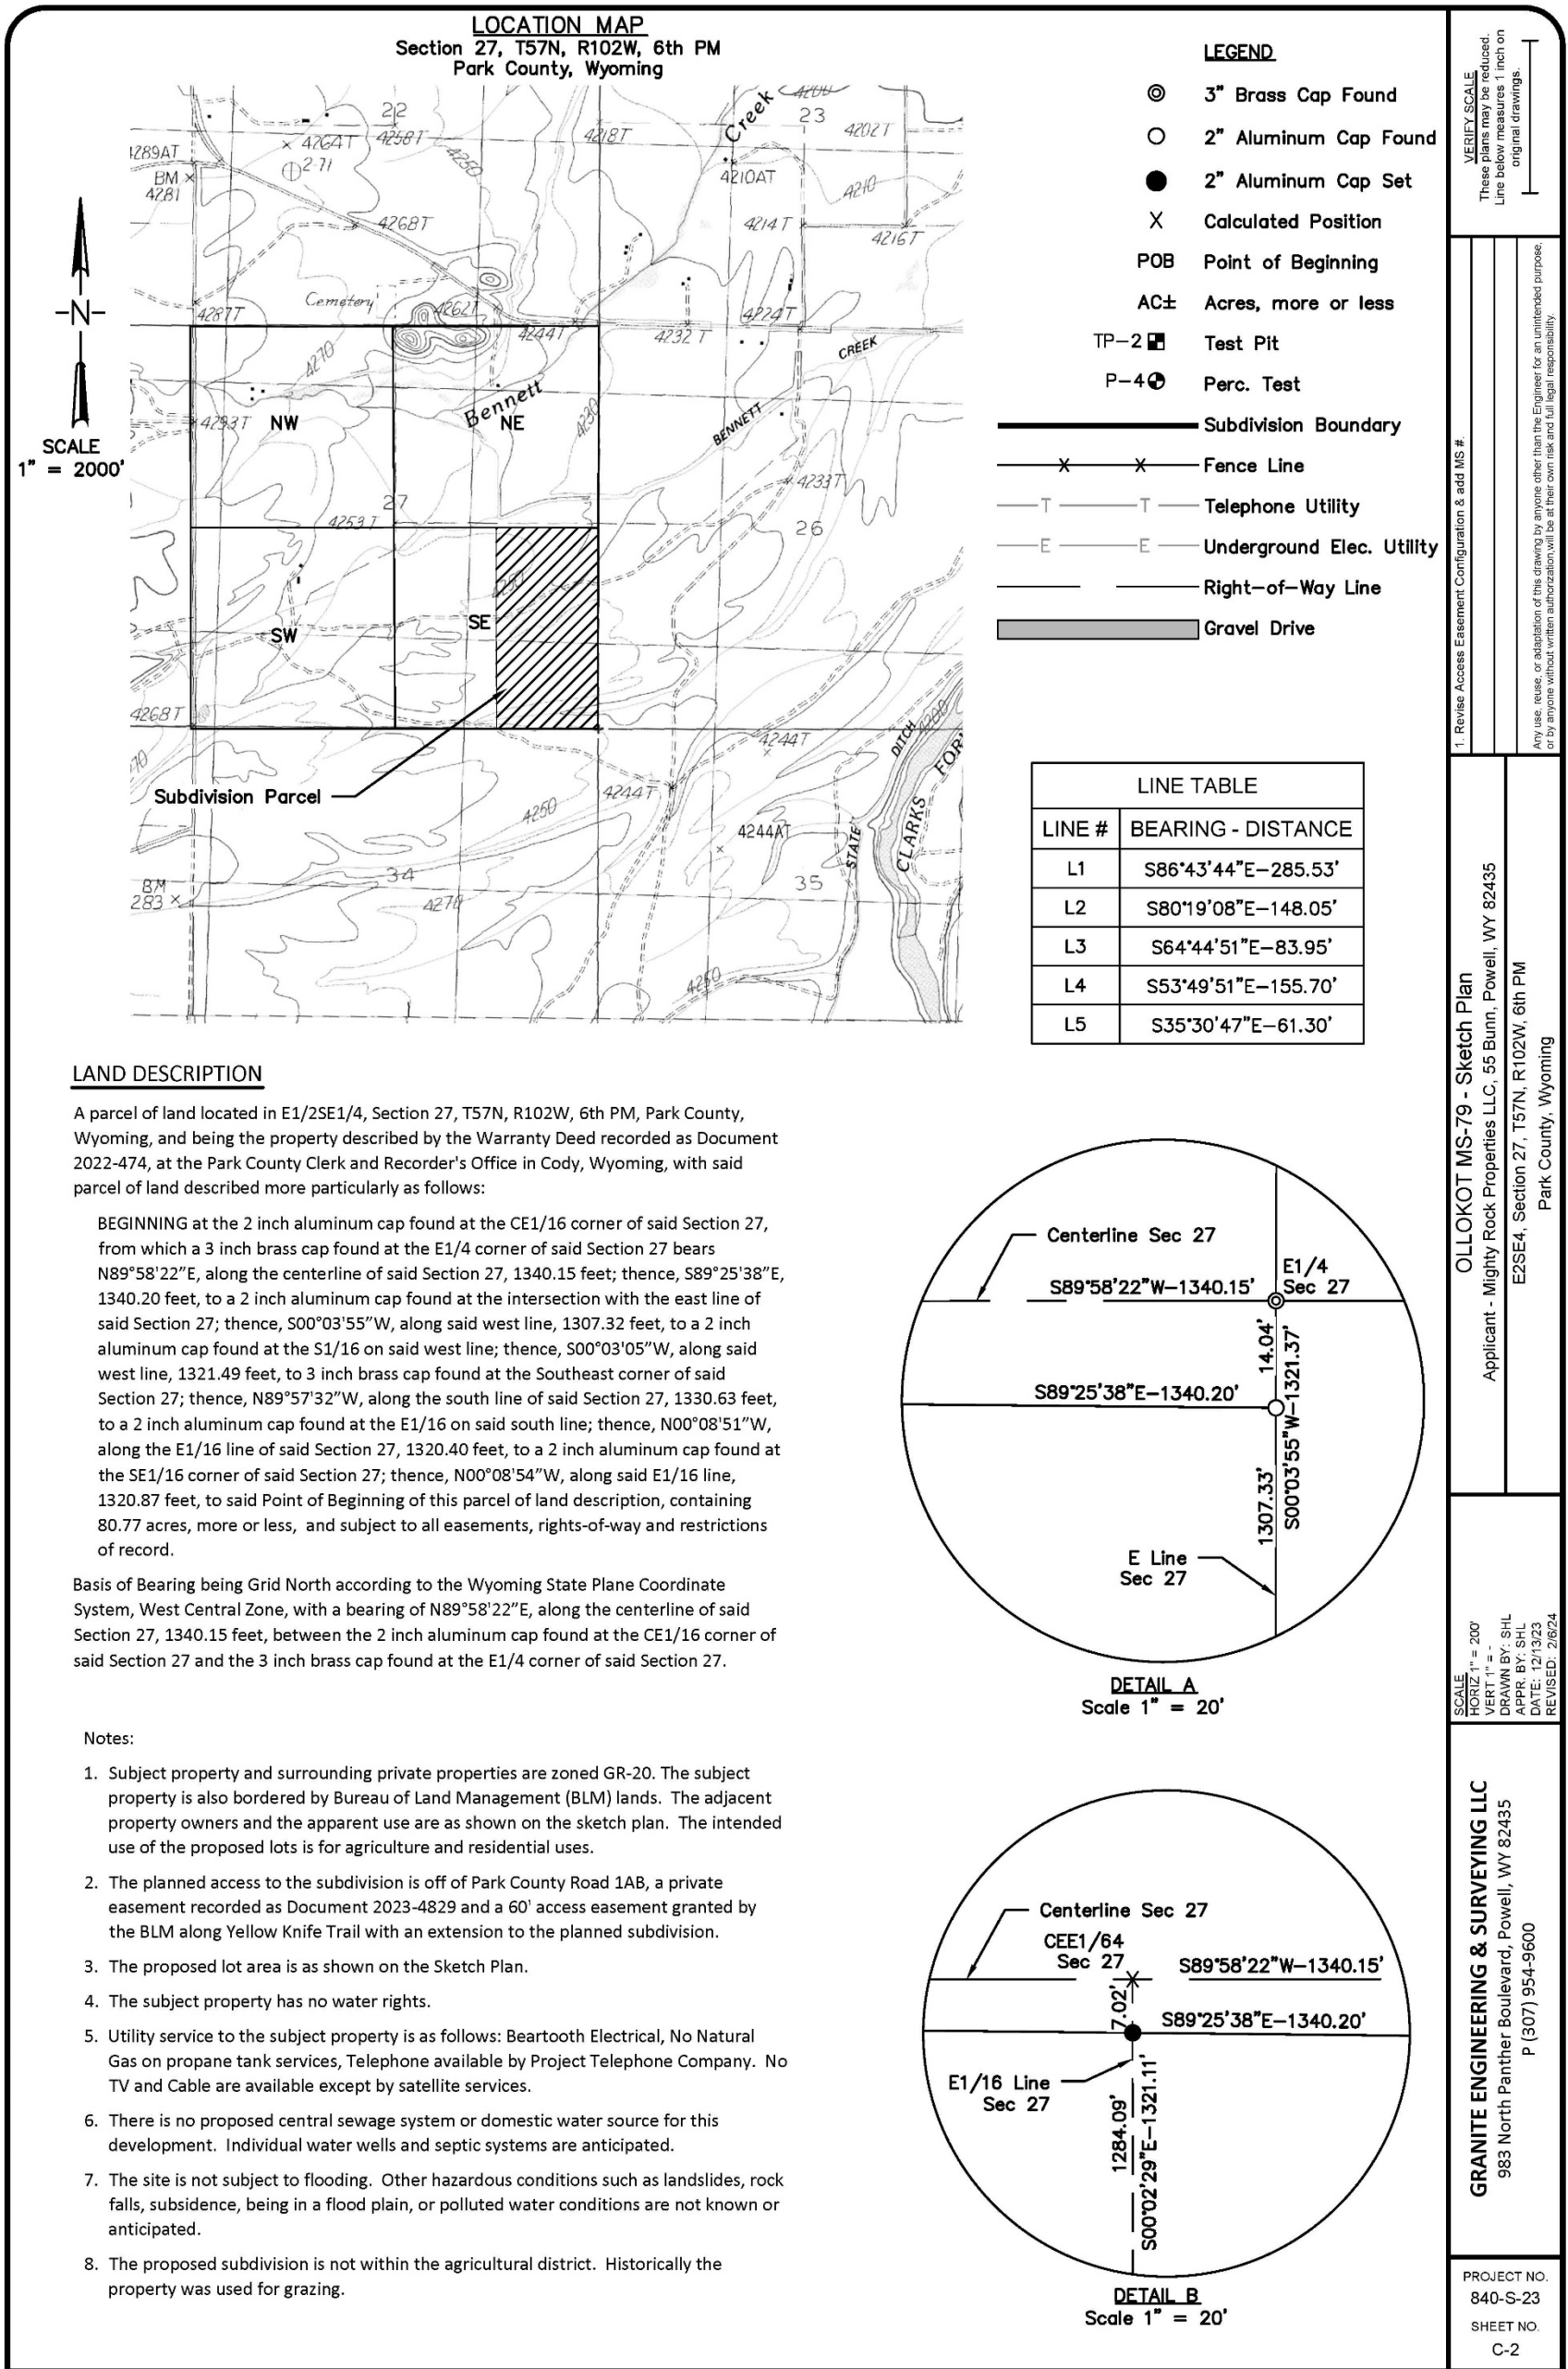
Ollokot MS-79 Sketch Plan, Page 2
